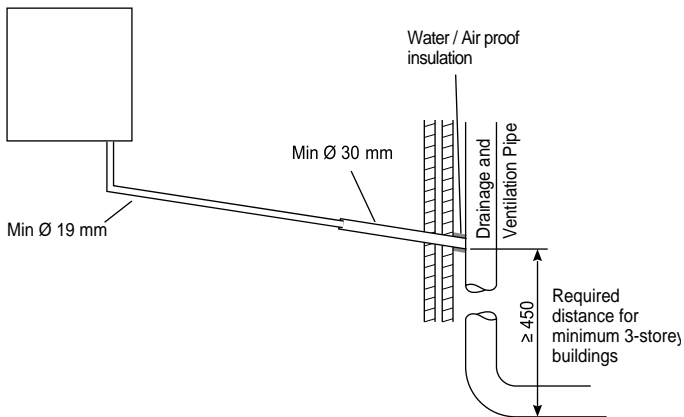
Connection of Condensate Drainage to Drainage and Ventilation Pipe
